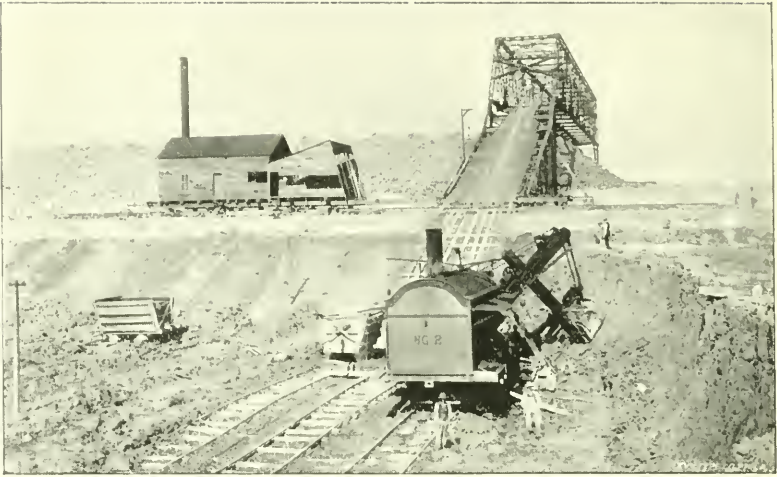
View looking north. End view of steam shovel, incline and 210-foot bridge at east end of upper cut. The steam shovel is at the end of its cut, which is about finished.
